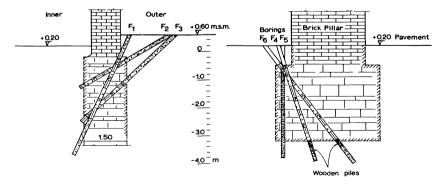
a) Cross-section of external wall foundations. b) Internal pillar foundations.
